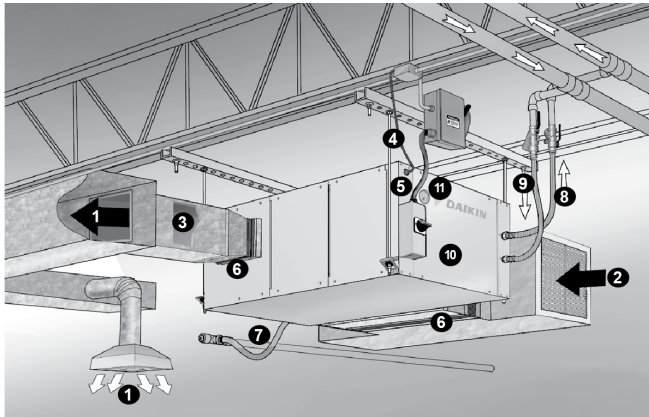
Horizontal Unit - Typical Installation In Ceiling
